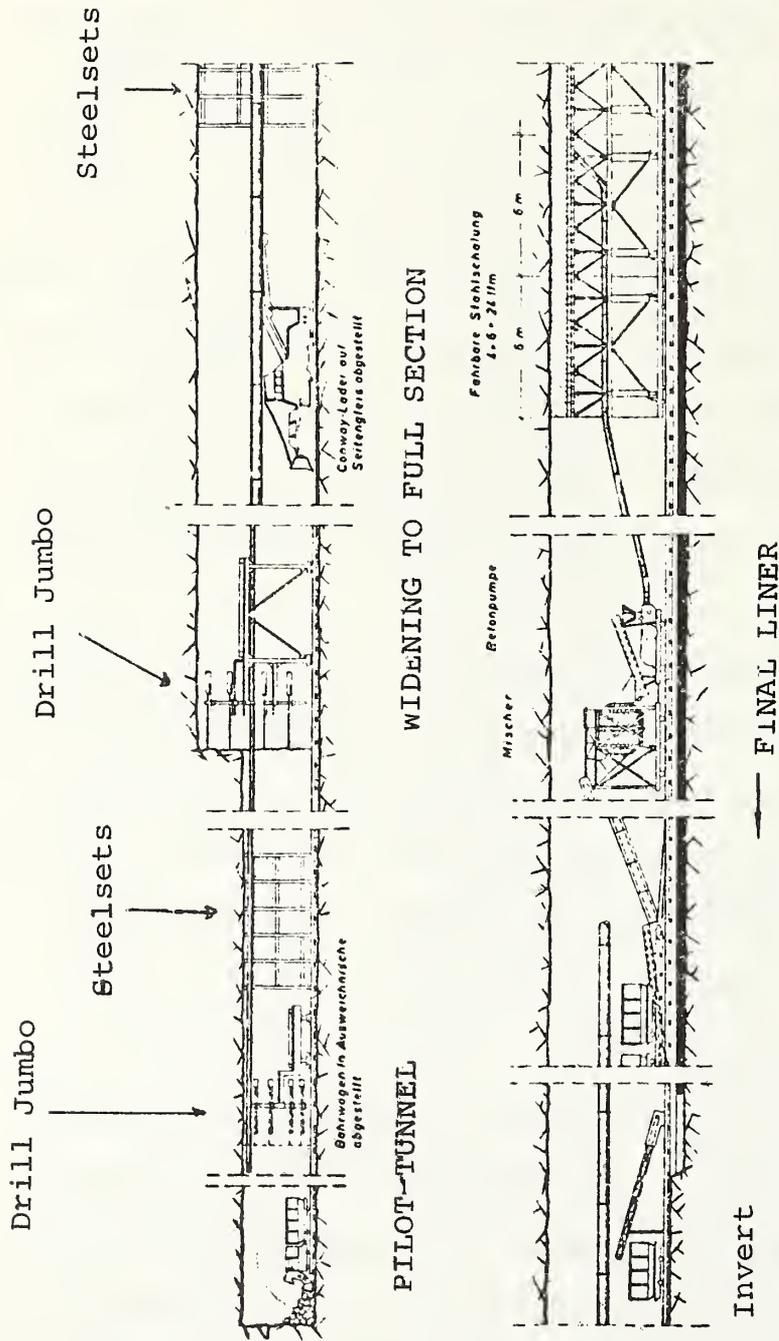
CONSTRUCTION METHOD OF PRUTZ-IMST TUNNEL (SECTION RUNSERAU)
